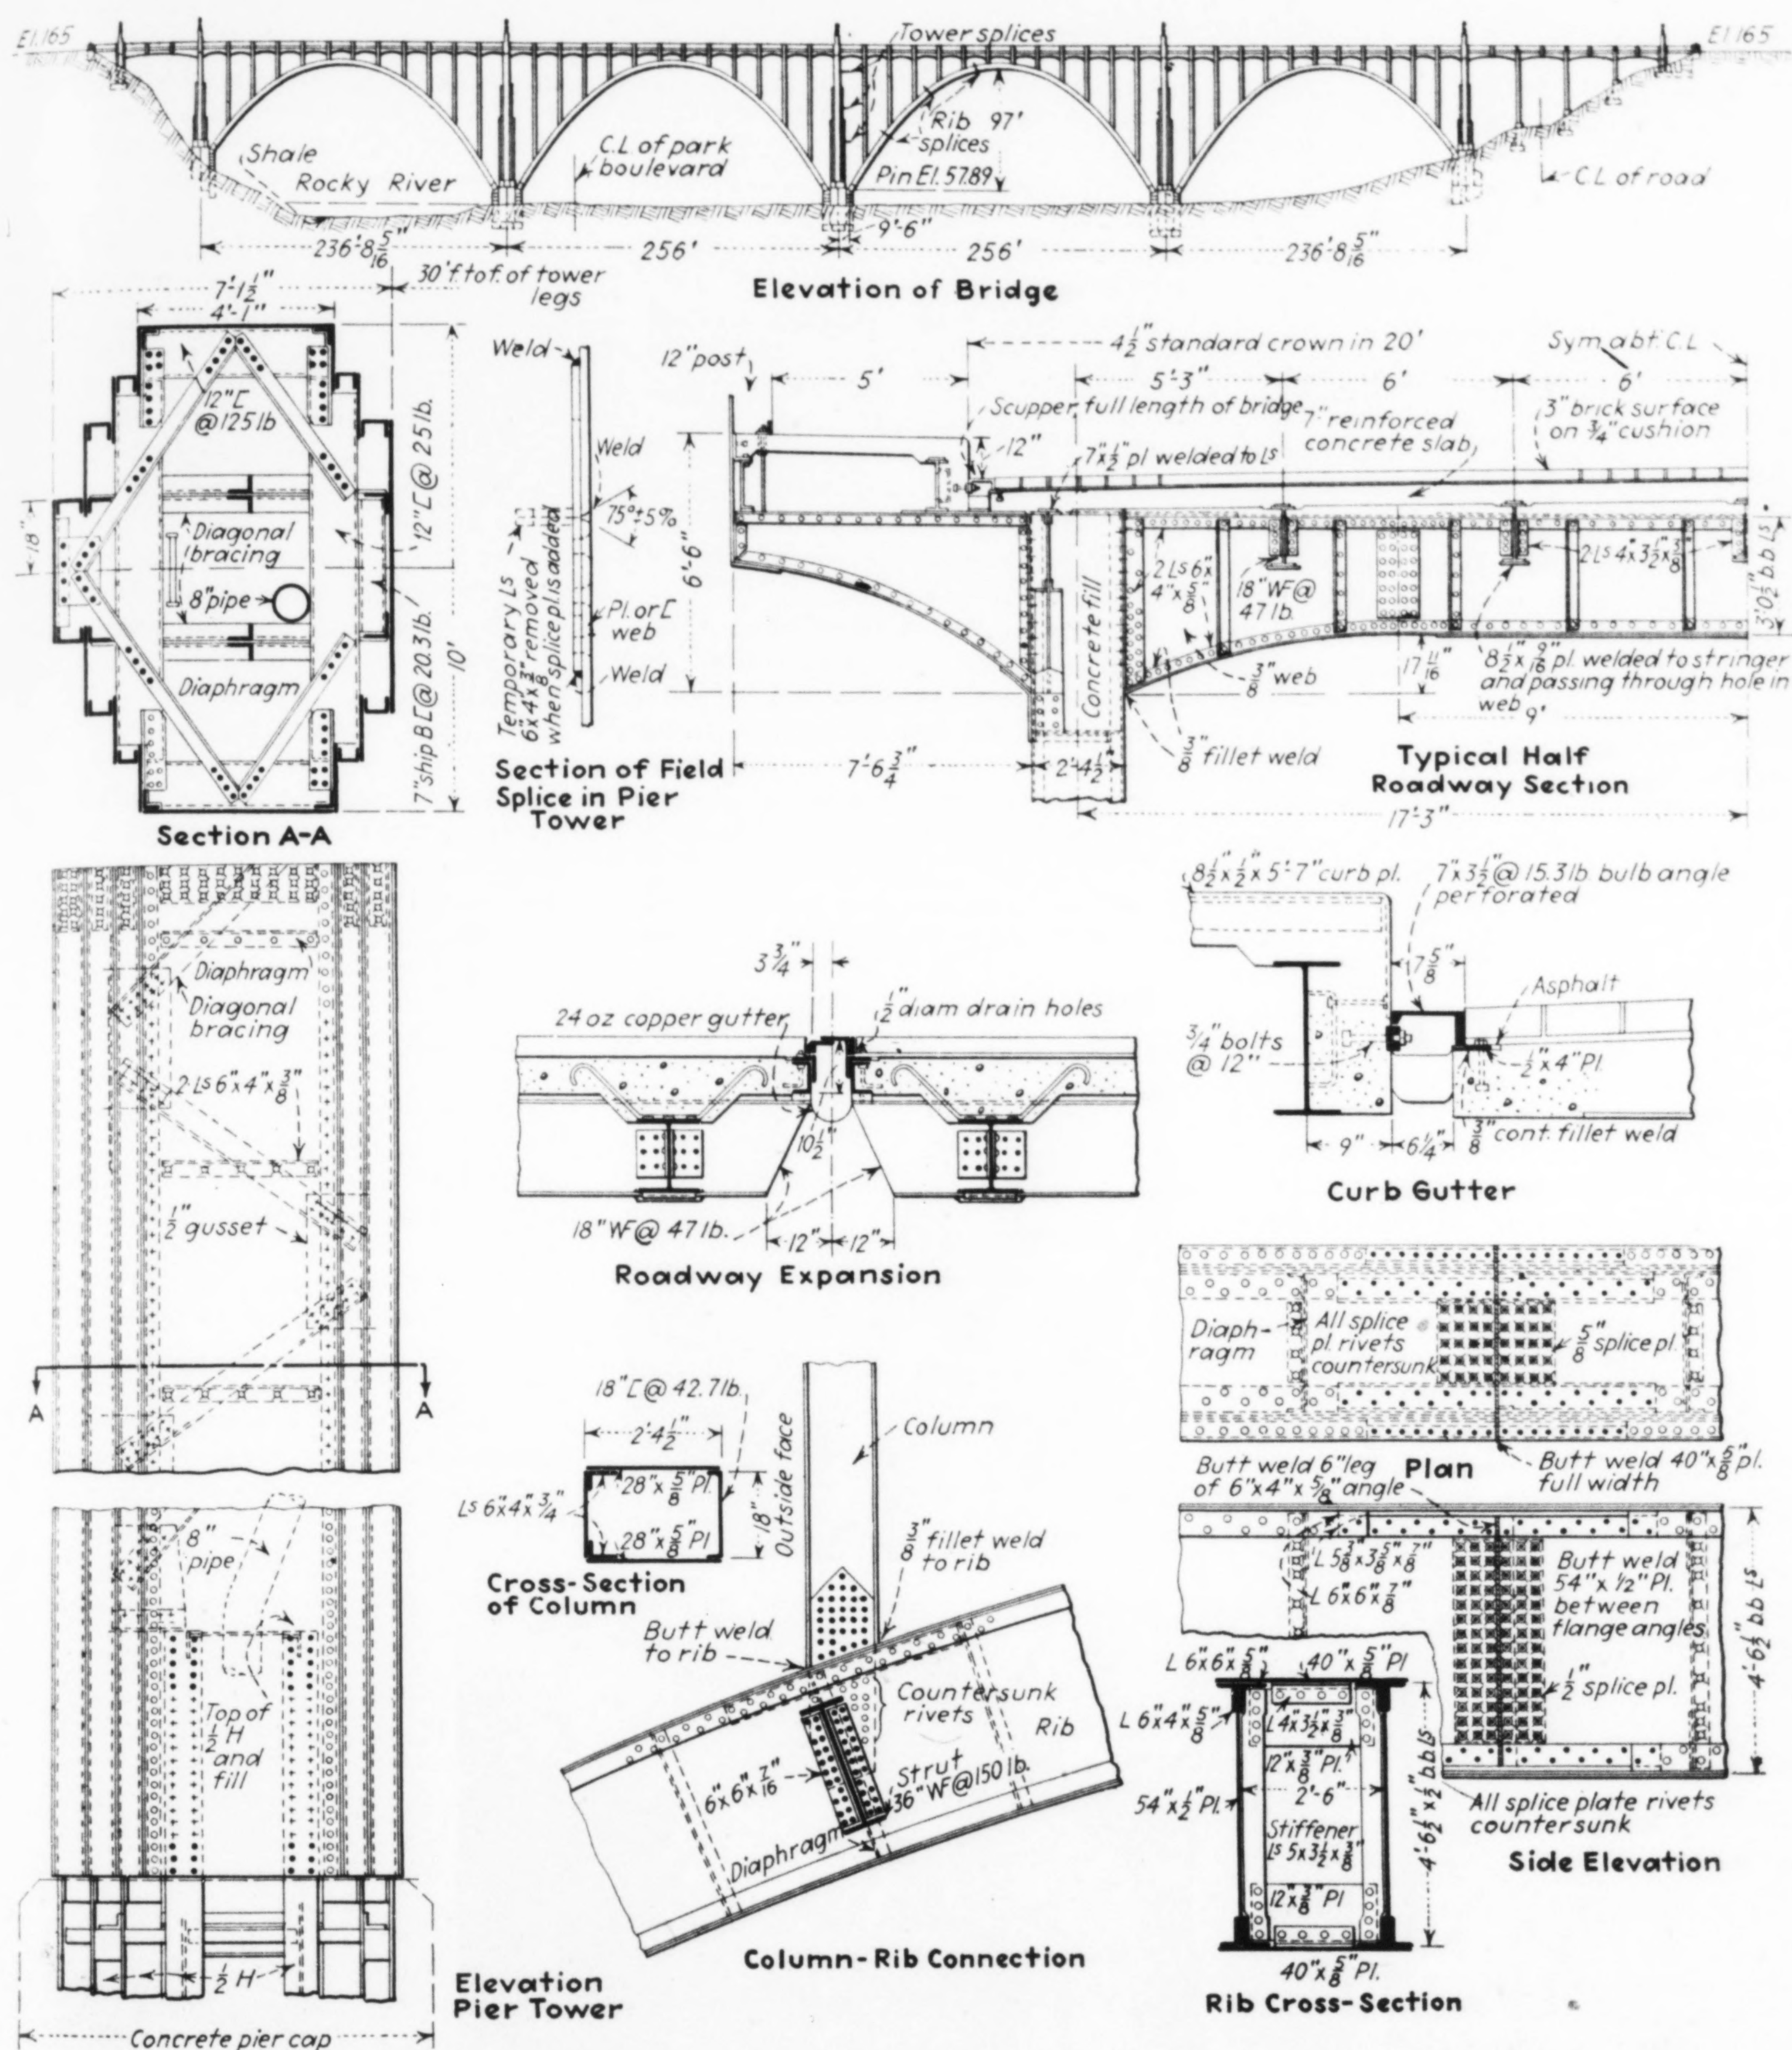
STRUCTURAL DETAILS include countersunk rivets, welded joints, continuous stringers, rigid frame bents and novel gutters.
